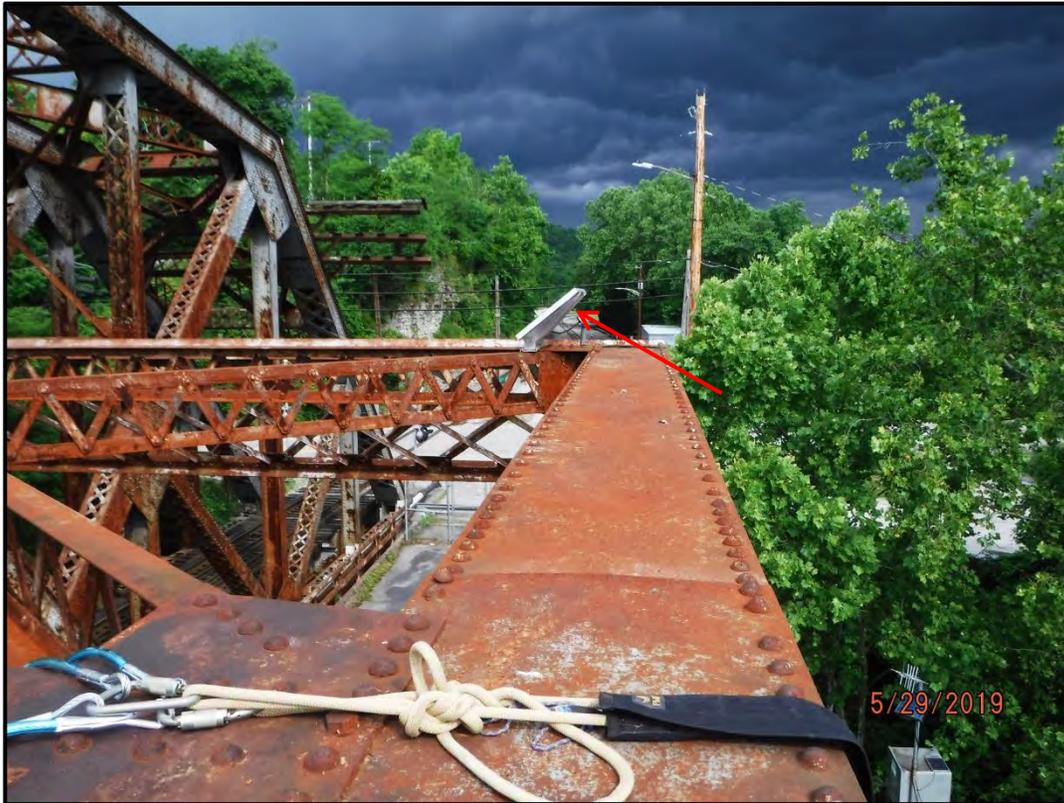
Navigation light solar panels located at downstream panel points U2, U8, and U15.
